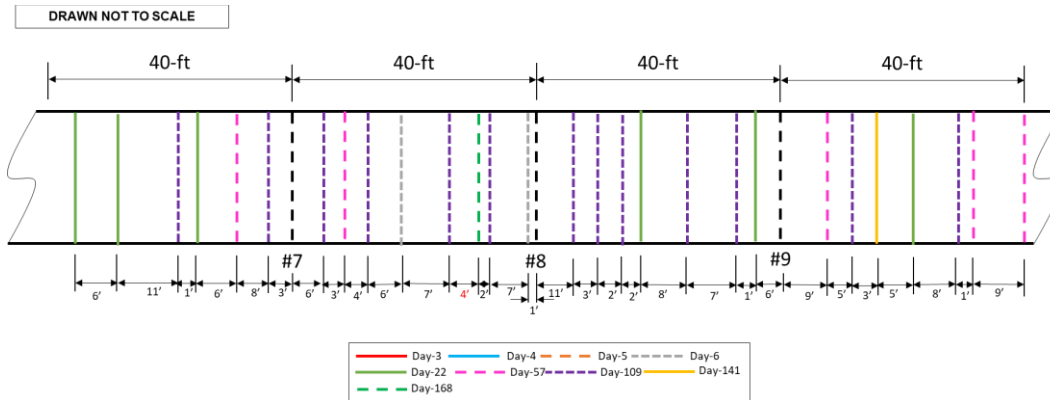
US62/180 El Paso test section crack map up to 168 days from concrete placement
